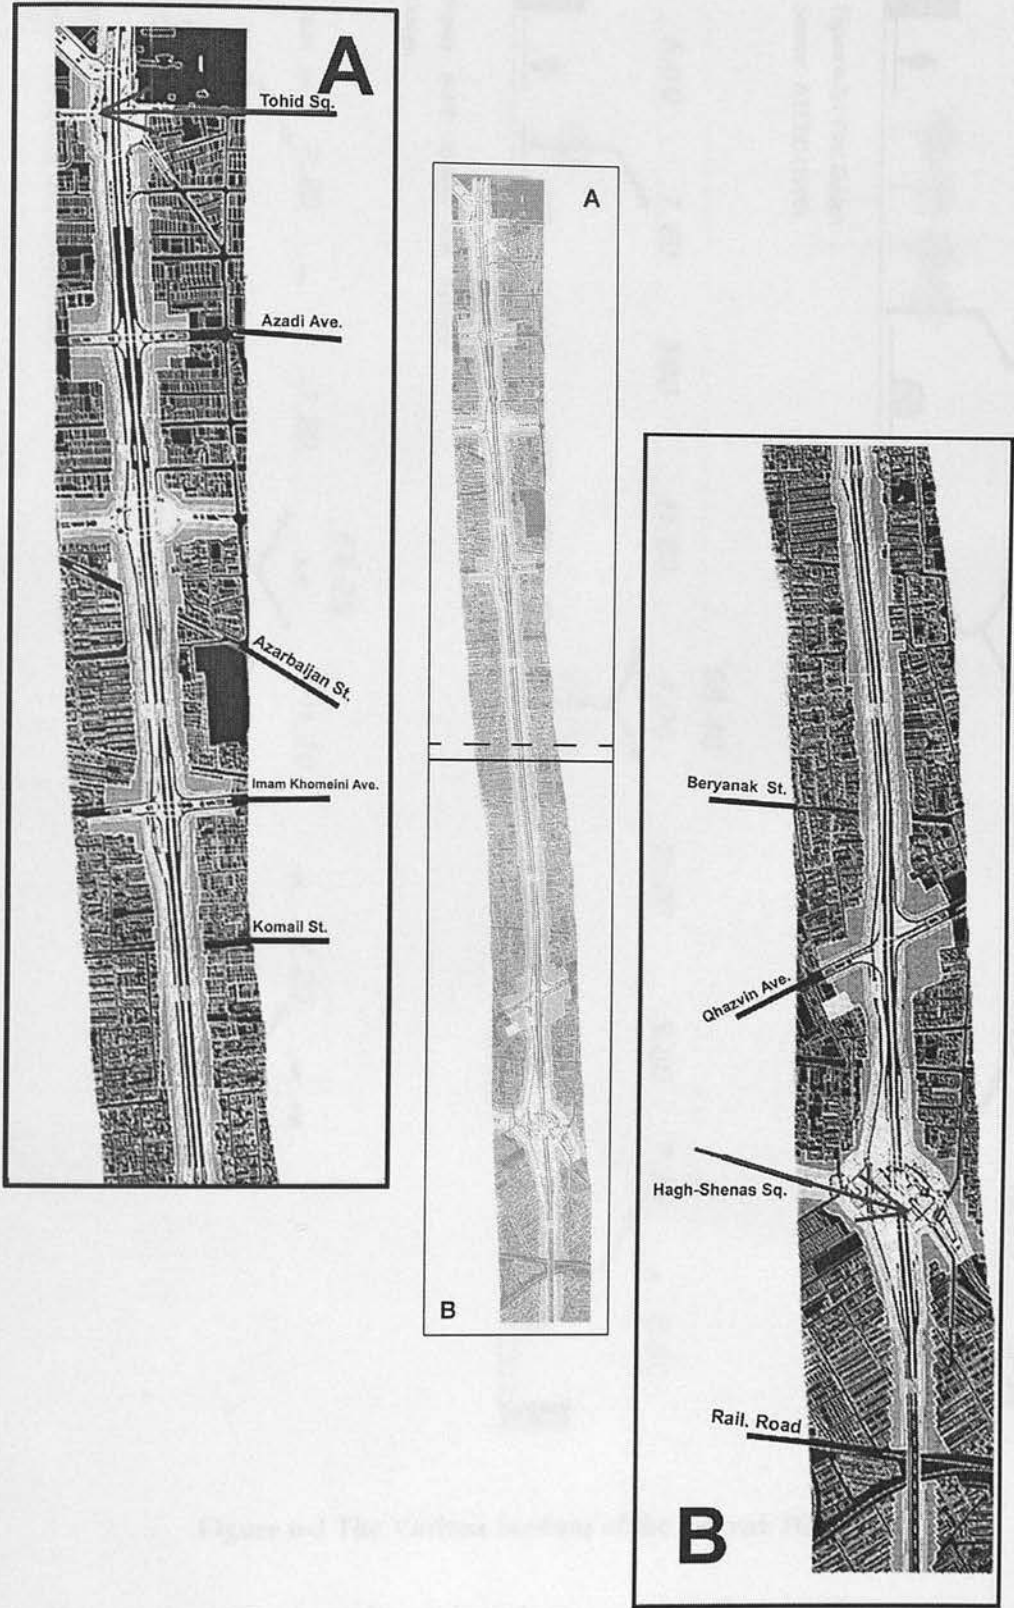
Navvab Highway Plan and Its Grade-Separated Junction and Limits of Construction
